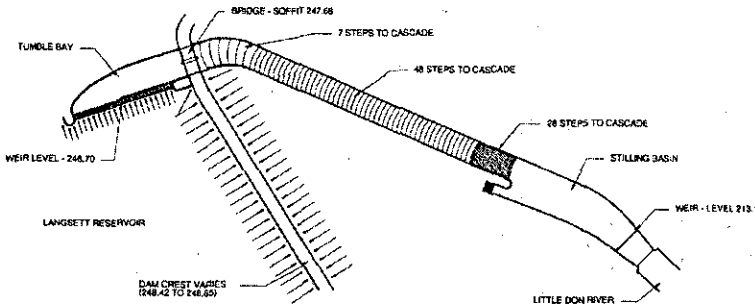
Schematic plan view of the Langsett reservoir spillway.
